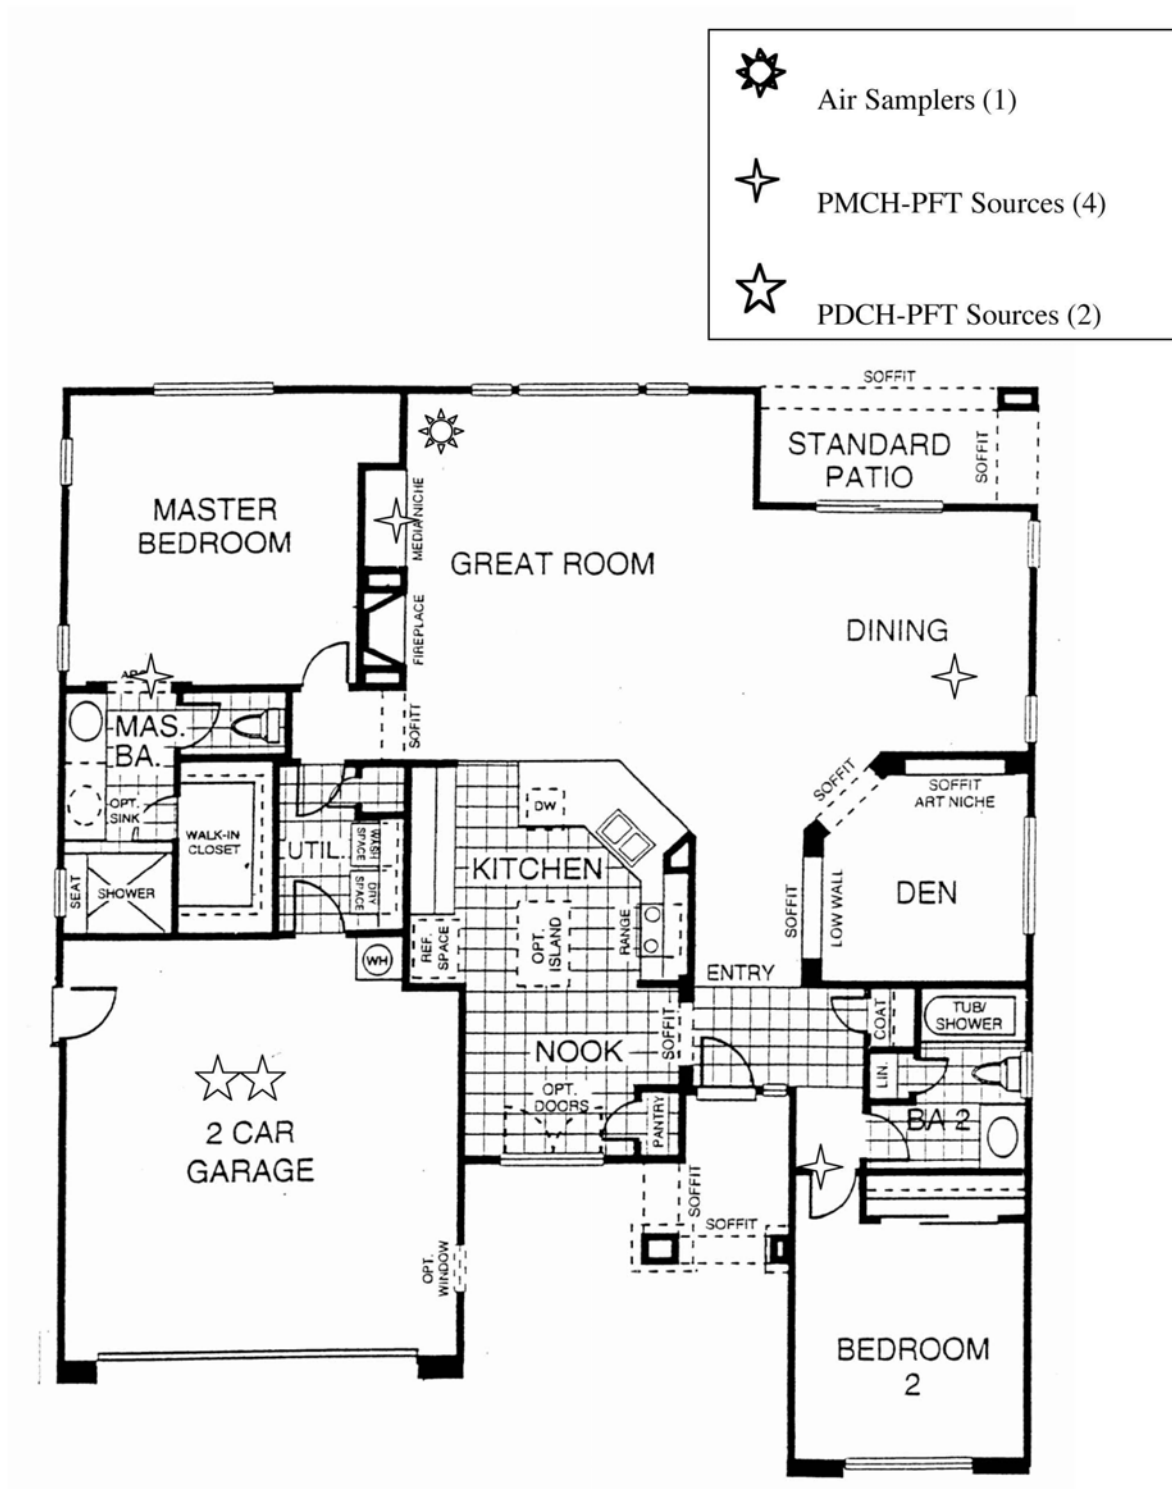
Floor plan of P2 depicting the locations of the air samplers and the PFT sources.
